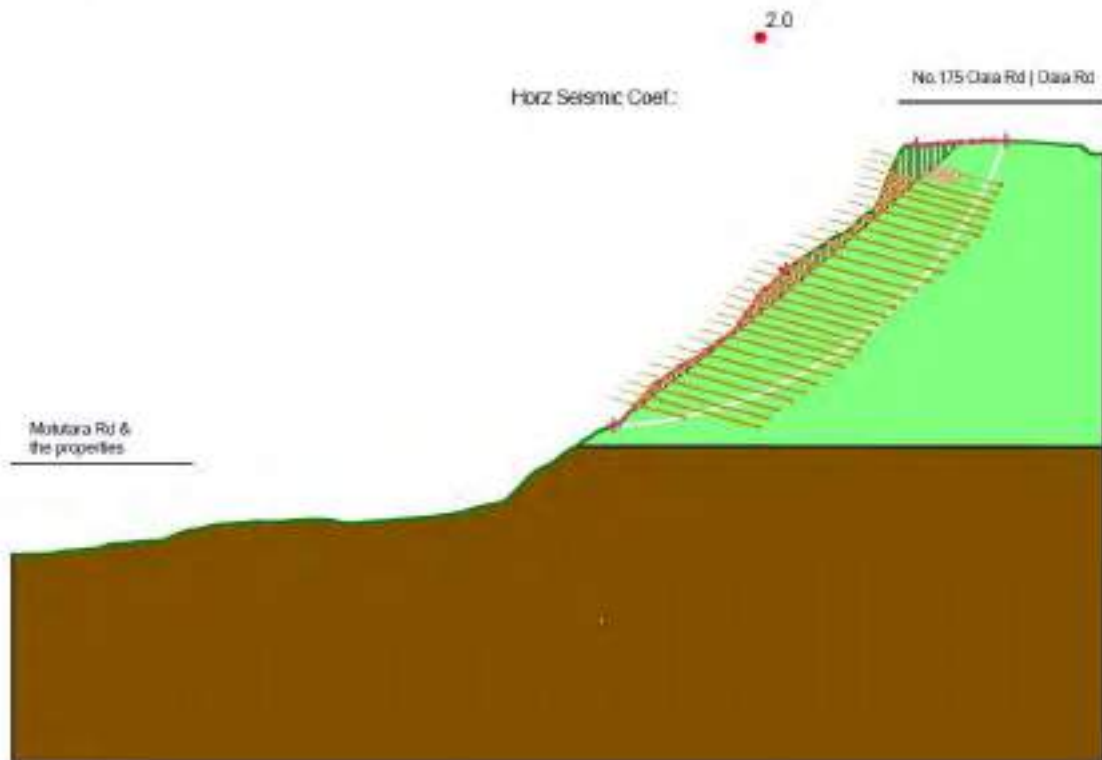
Nail Option - Shallow Failure Surface (Static Case)
